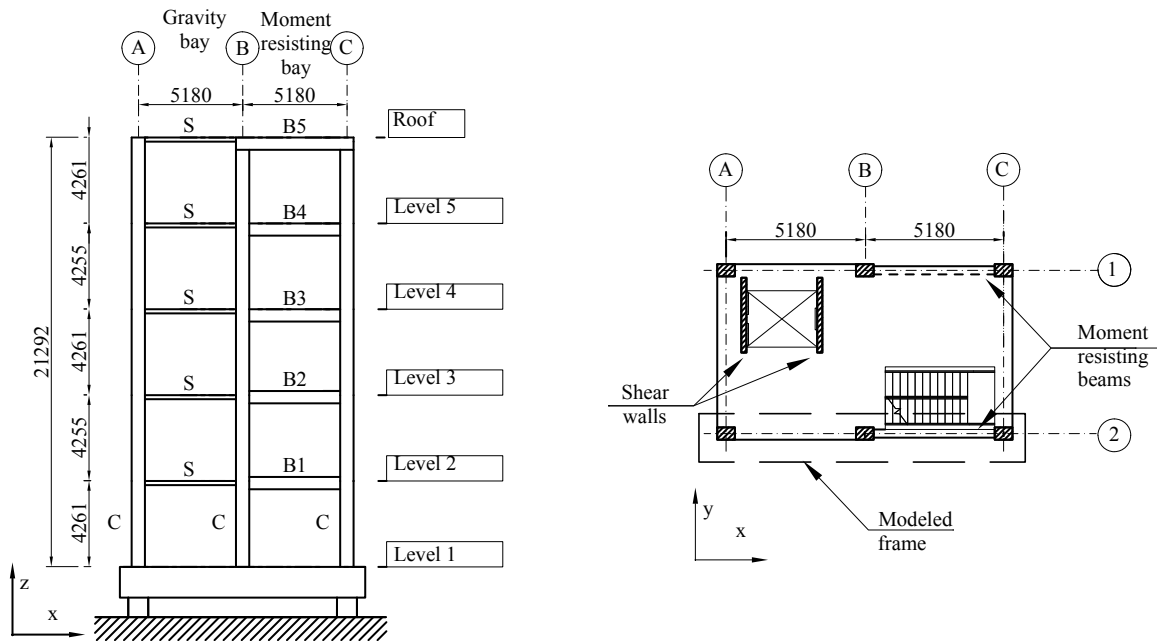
Elevation and plan views of modelled full-scale test structure [179]
